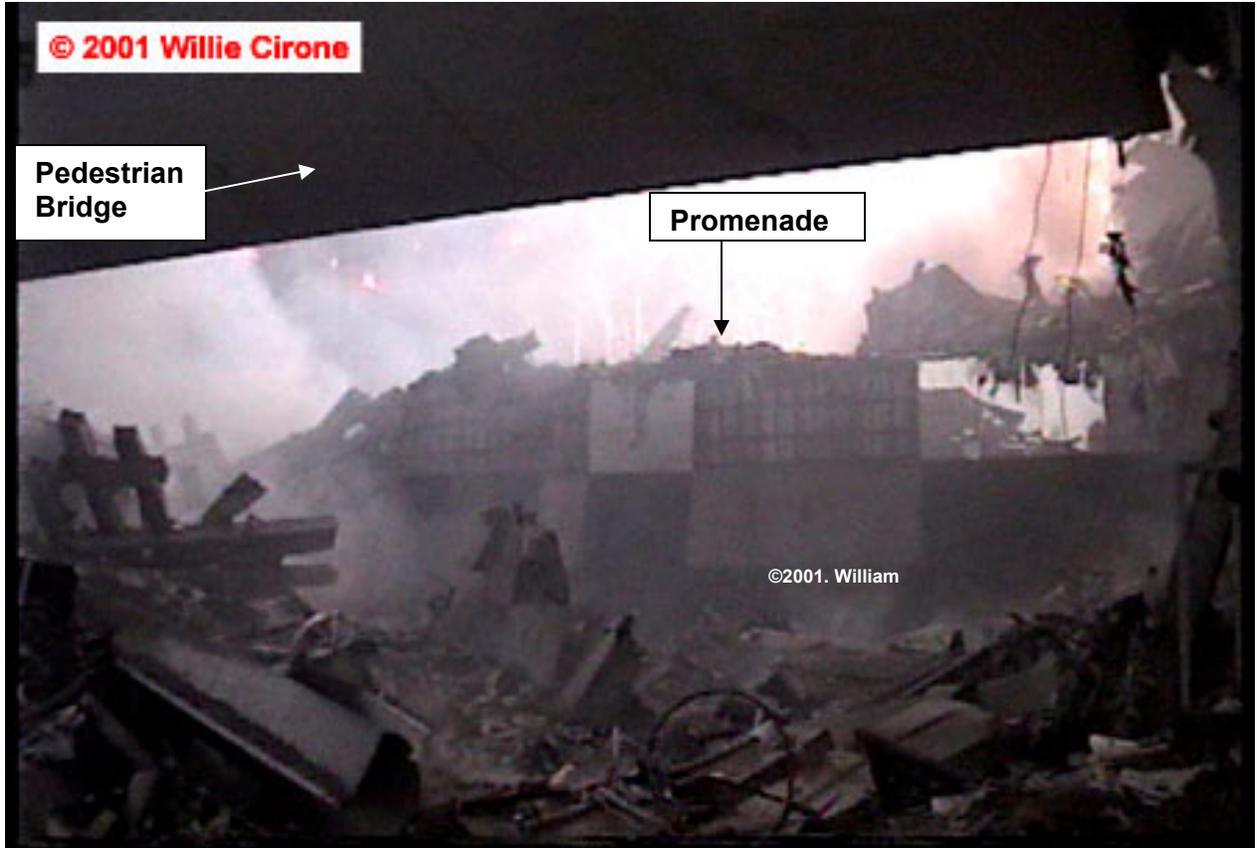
WTC 7 Promenade and debris on Vesey Street after WTC 1 collapsed.
